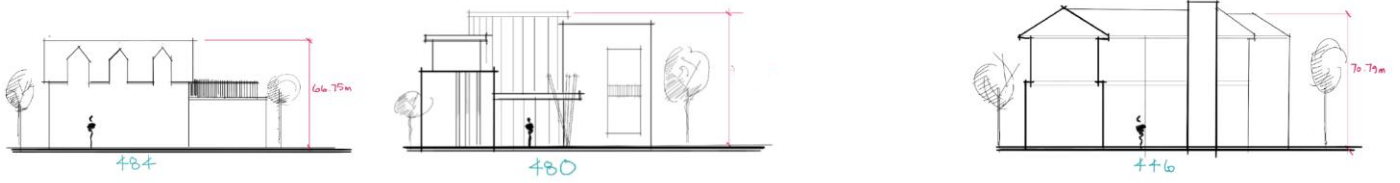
Roof Elevations of the homes along Cloverdale and Lakehurst Roads. Source: Linebox Studio
